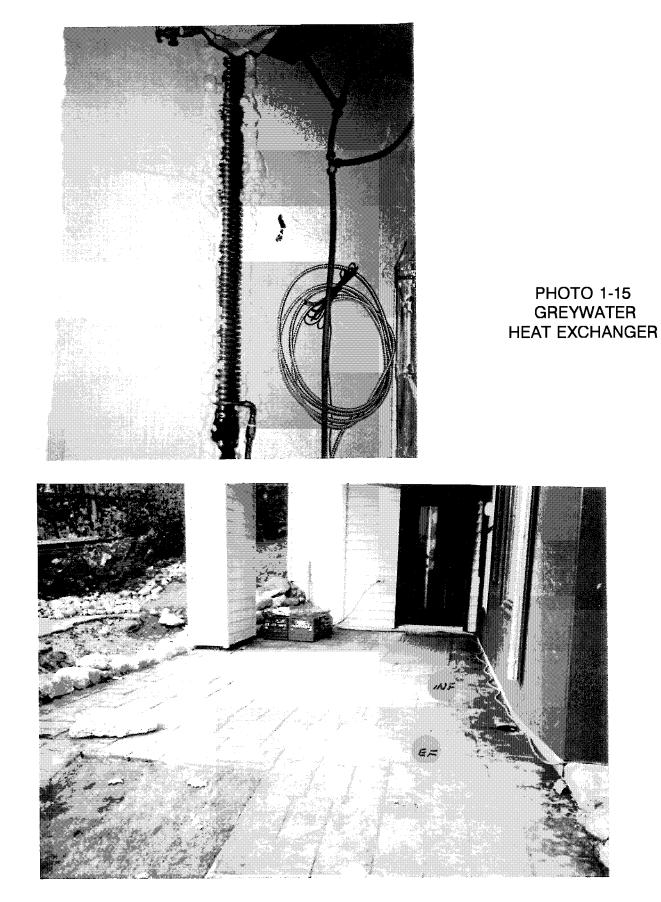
SEPTIC TANK UNDER CARPORT
